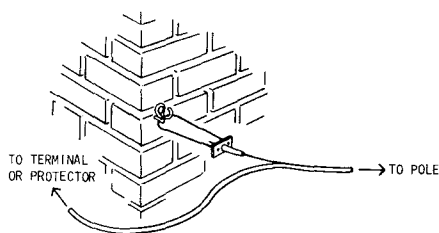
Multiple Drop Wire Installed at First Building Attachment
